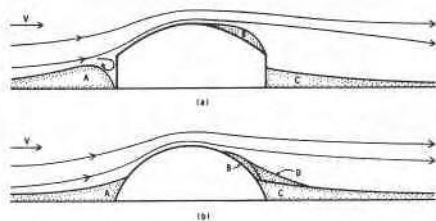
Snow Accumulation on Arch-Type Roofs
